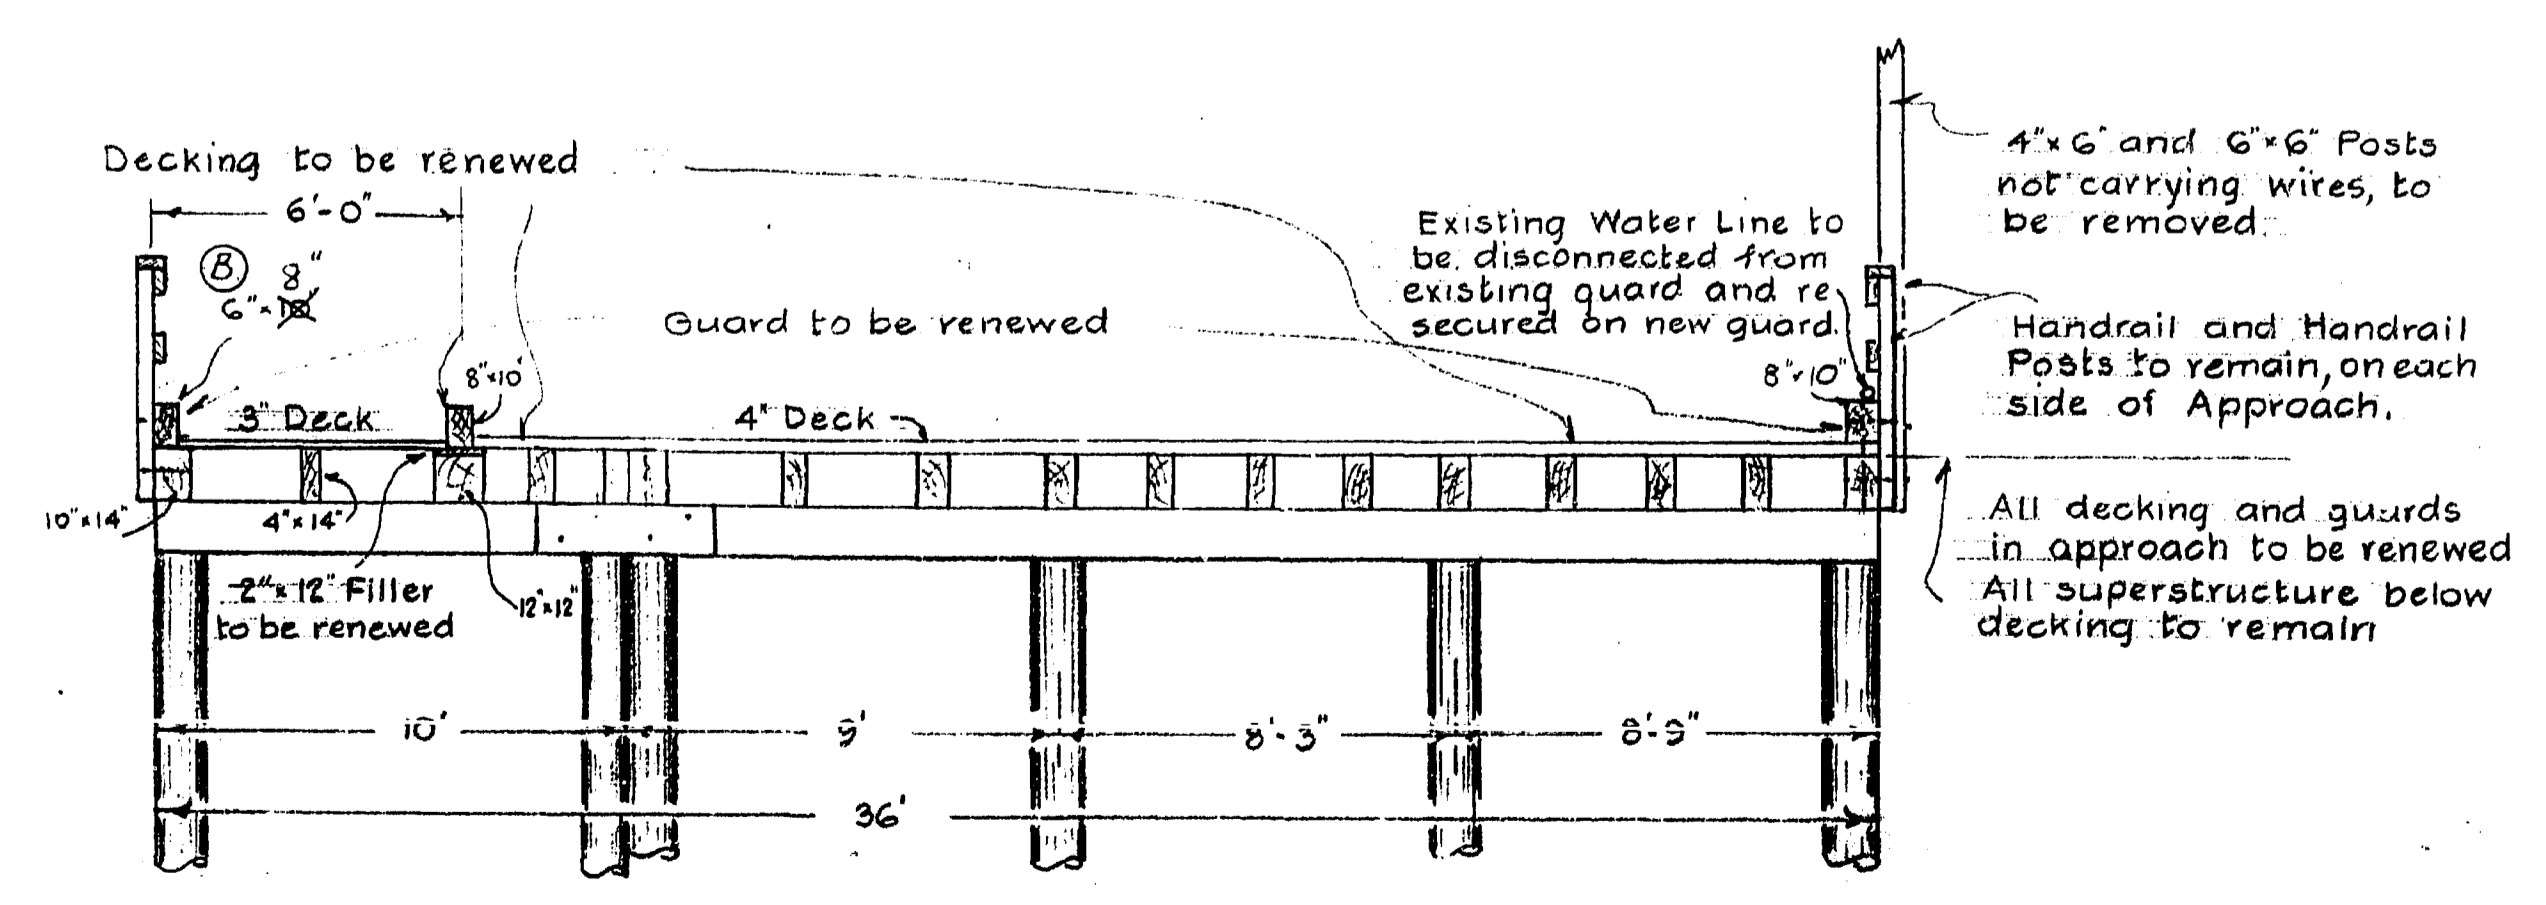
TYPICAL APPROACH CROSS SECTION A-A
